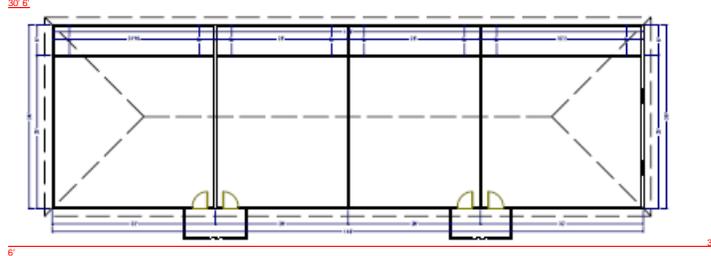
Multifamily Prototype Floor Plan – 1st Floor
